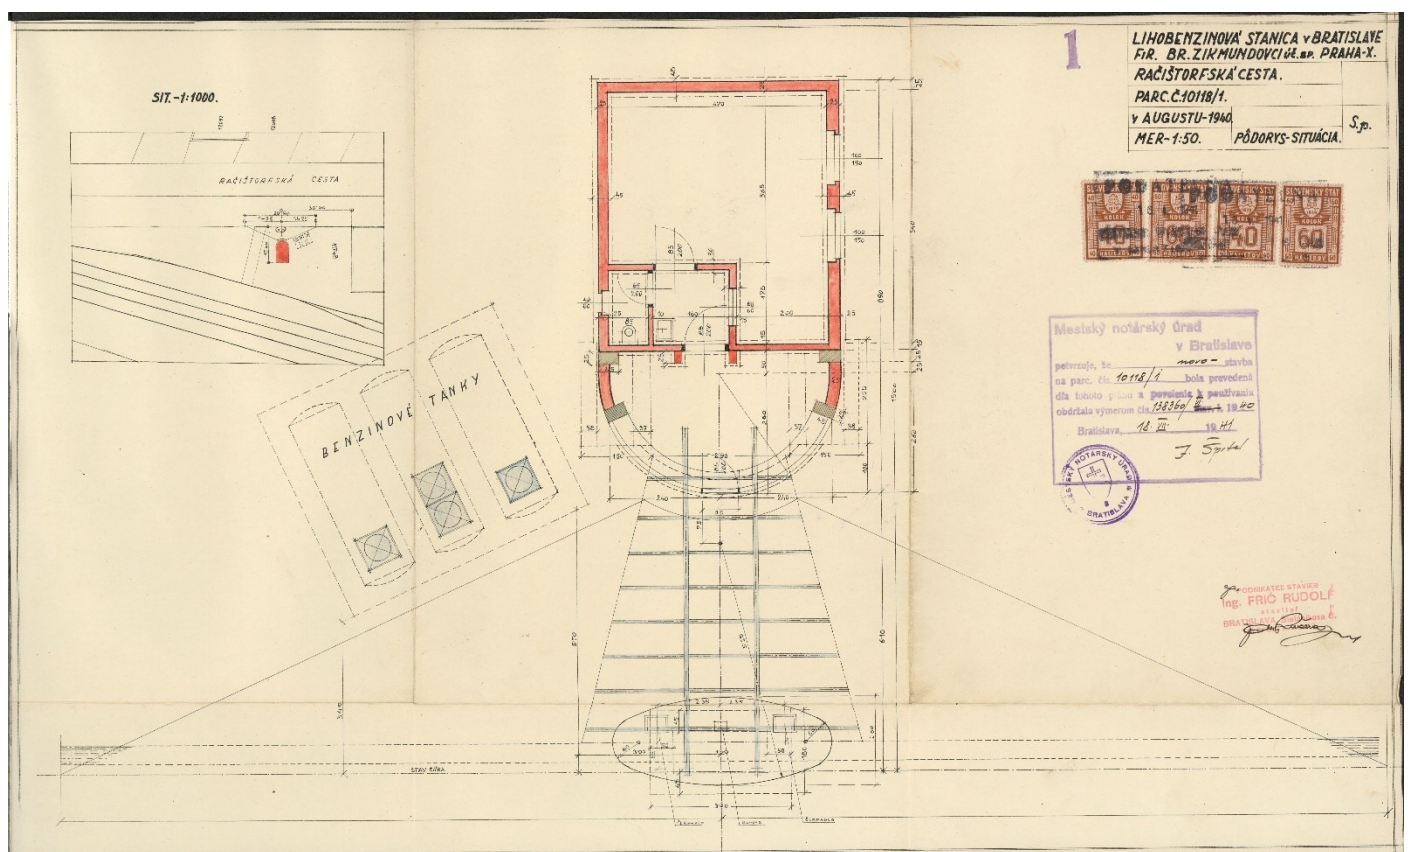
Jan Slaviček, The Zikmund Brothers' gas station, Račianska Street, Bratislava, 1940. Ground floor and site plan. (Source: Bratislava City Archives, 1940)
